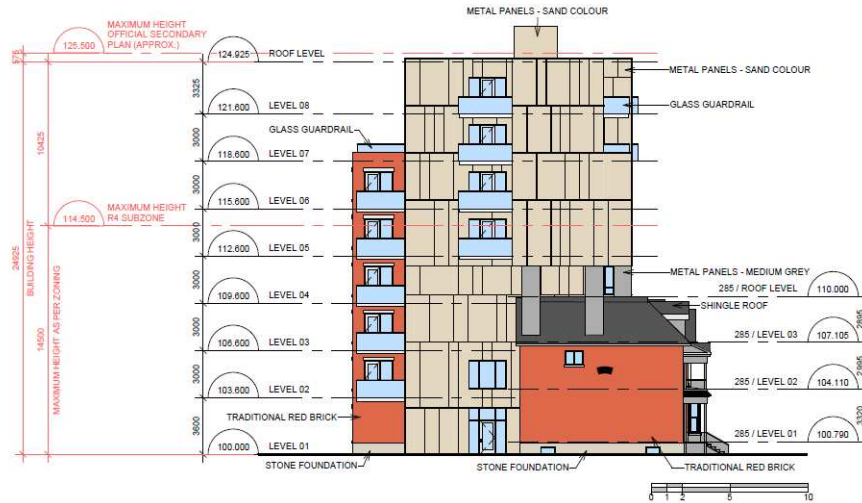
West elevation of the proposed development at 283 and 285 McLeod Street
